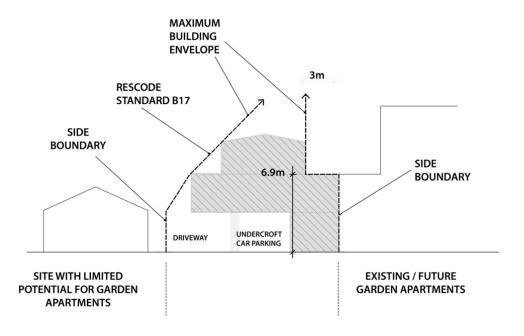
Alternative Development Forms: Walls on Boundaries and Side Setbacks (elevations)
